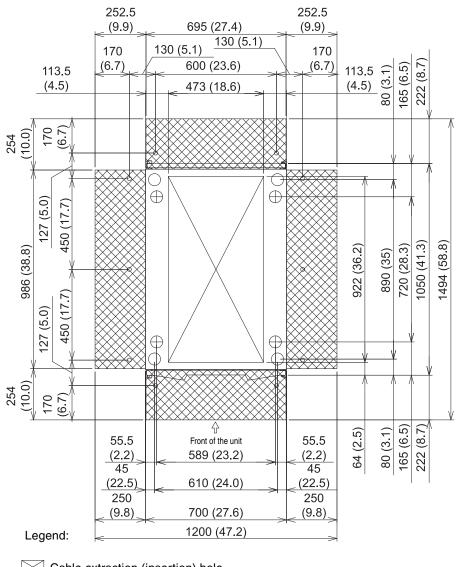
Floor Plan of the Equipment Rack Model 1740
